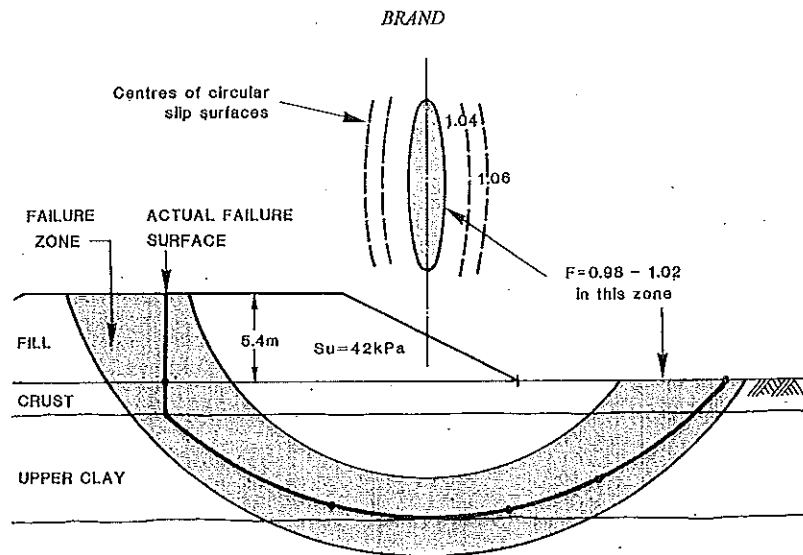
Reanalysis of the embankment failure, showing the possible failure zone
